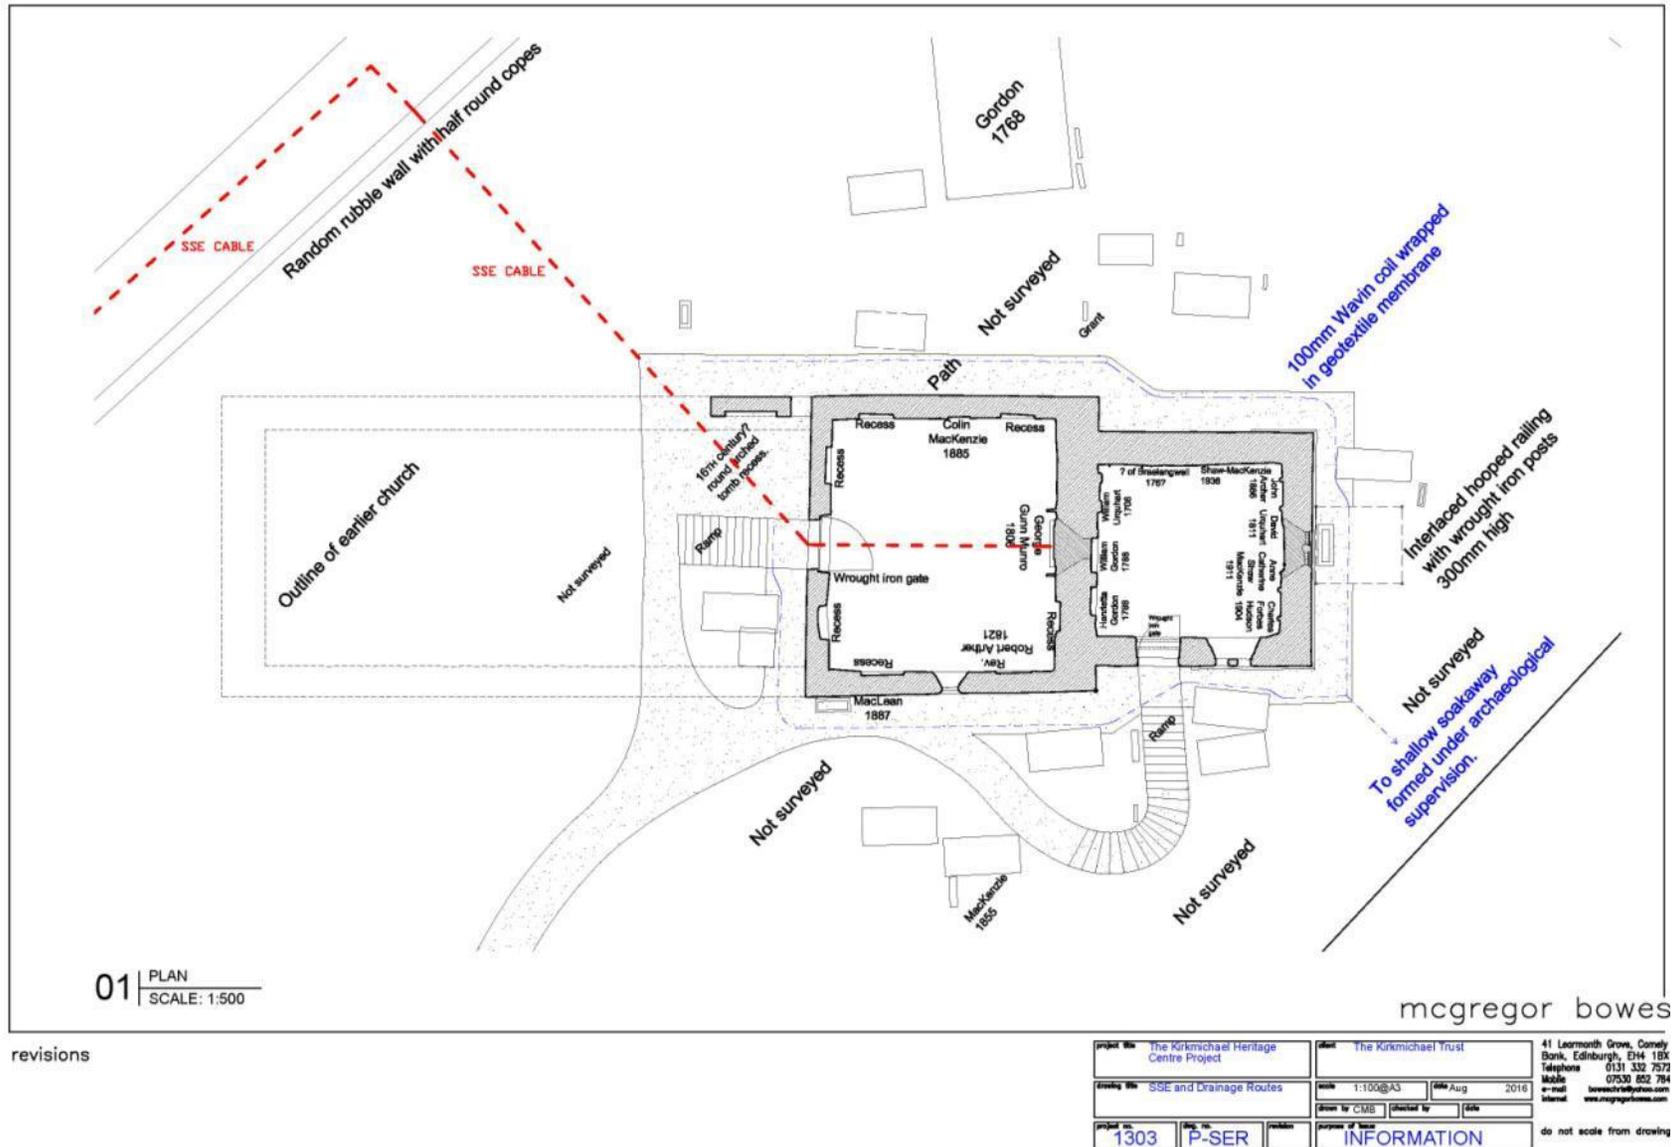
Site Plan (courtesy of Architect) with initial proposals
